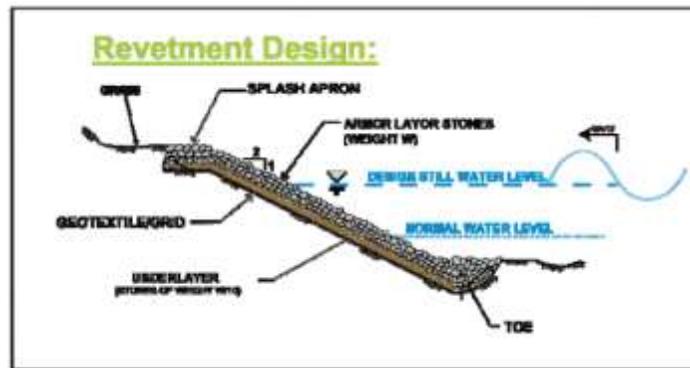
TYPICAL REVETMENT DESIGN CROSS SECTION¹²
